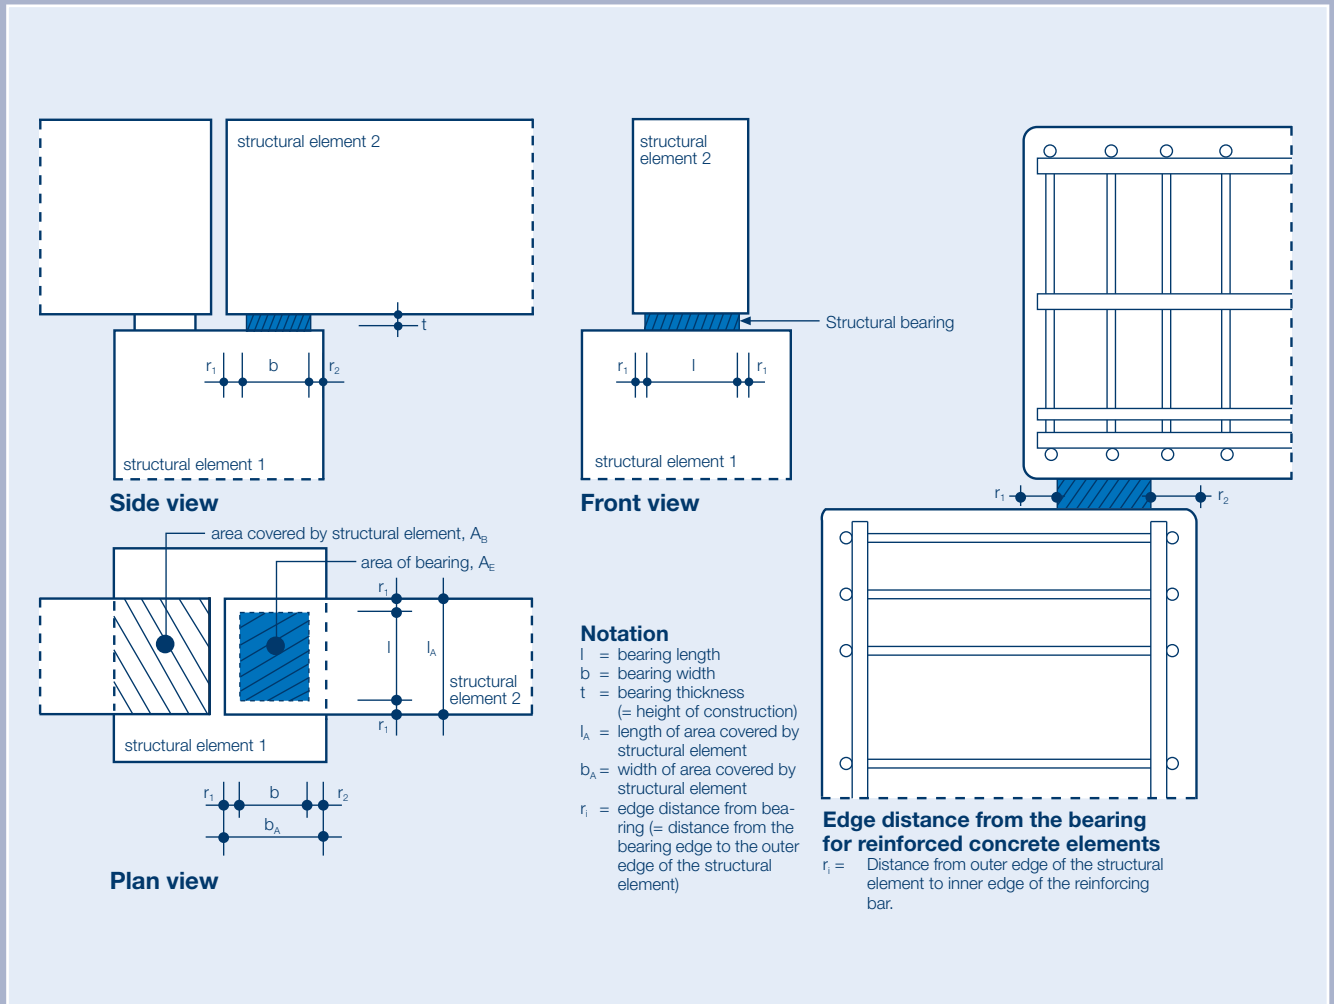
Maximum size of plan area of an elastomeric bearing for reinforced concrete construction (edge distance). For timber or steel elements the edge distance shall be at least 3 cm or 1,5 times the bearing thickness.
